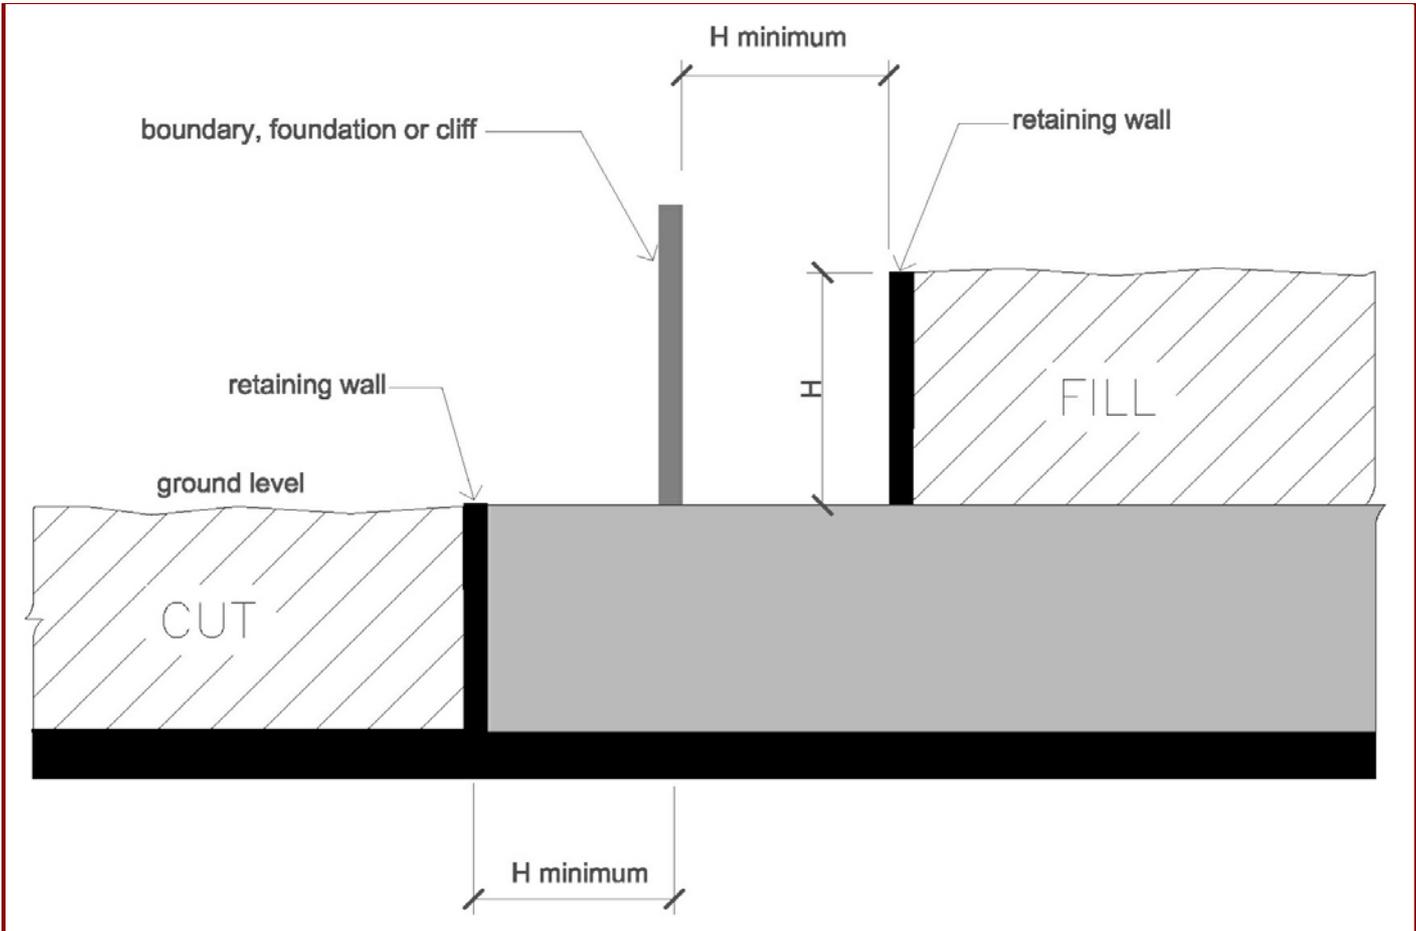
A.5.4B: Cut and fill supported by retaining walls (elevation view)
